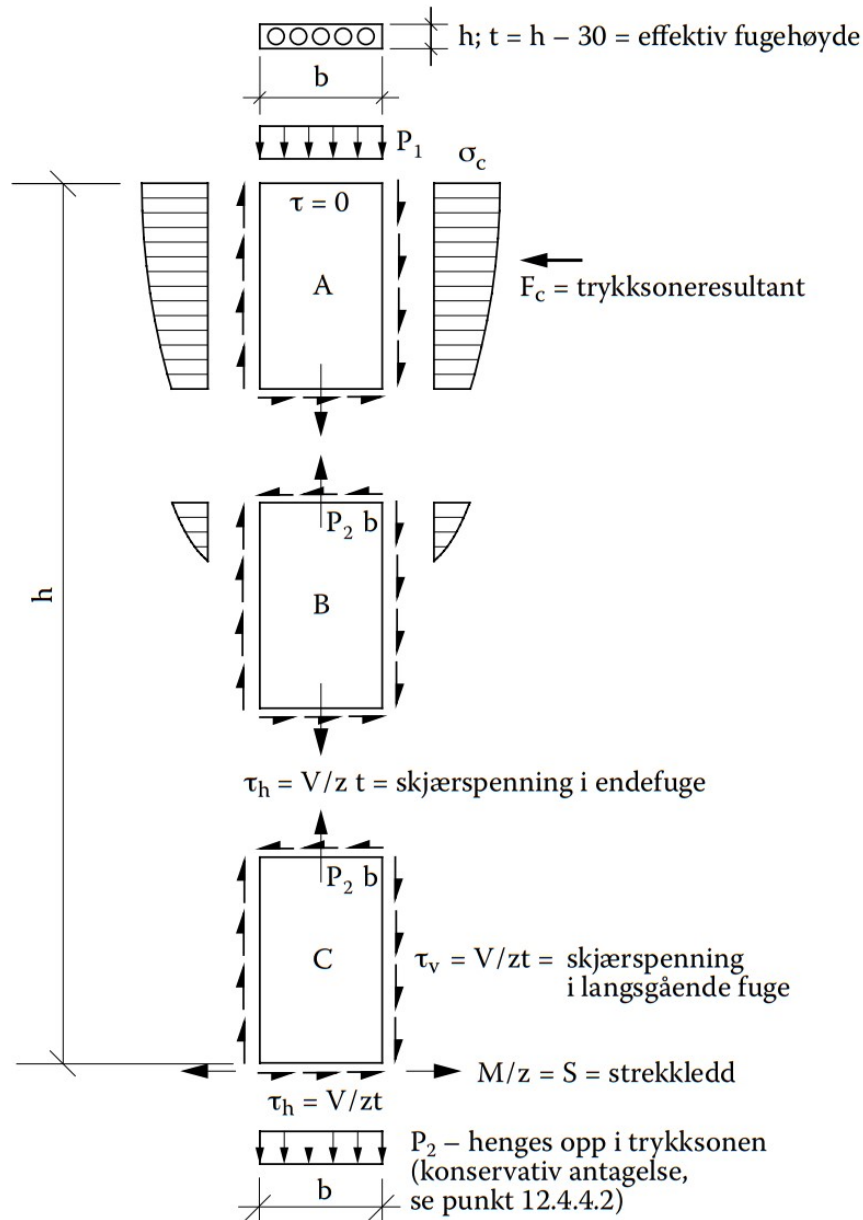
Monolithic floor built up by elements thereafter divided into zones [12]
